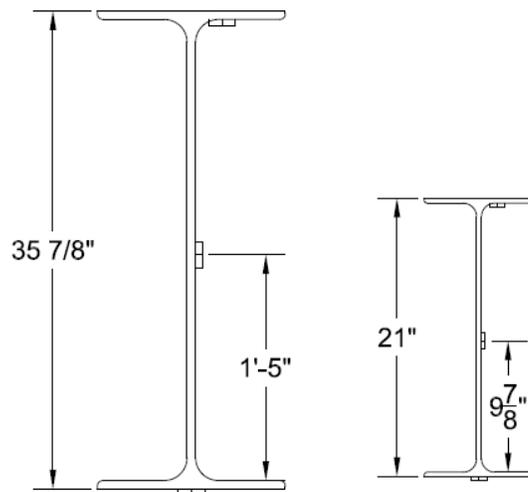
Gage location on Indian Purchase cross section of floor beams and stringers respectively
